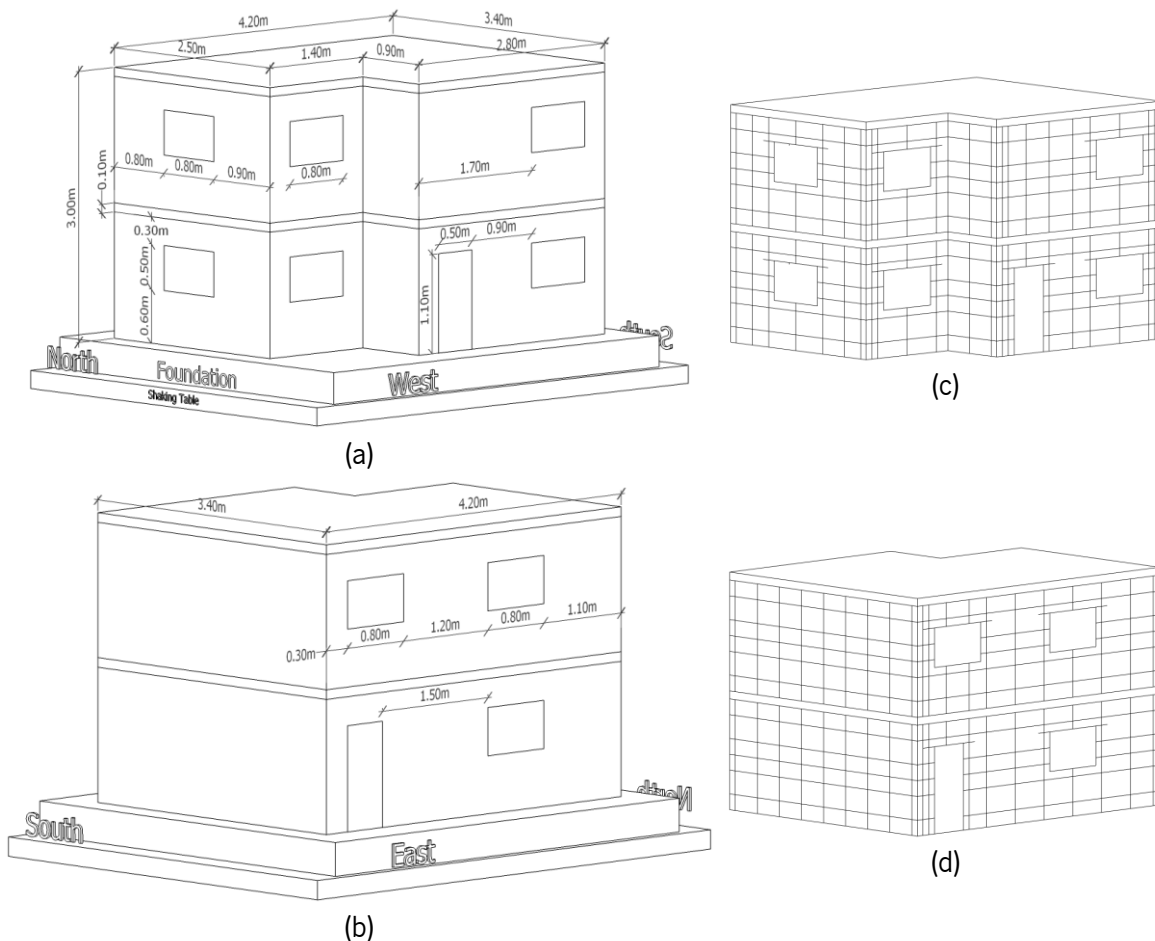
Adopted geometry for asymmetric buildings: (a and b) dimensions for UM and RM models, (c and d) reinforcement distribution for all walls
